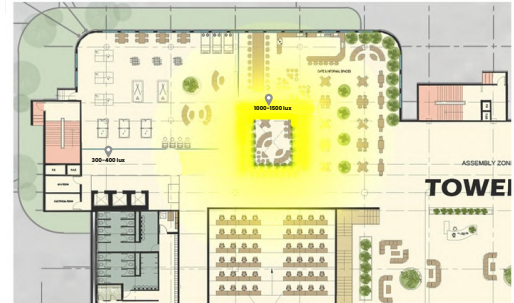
TYPICAL FLOOR PLAN WITH SOLAR LIGHT PIPE
